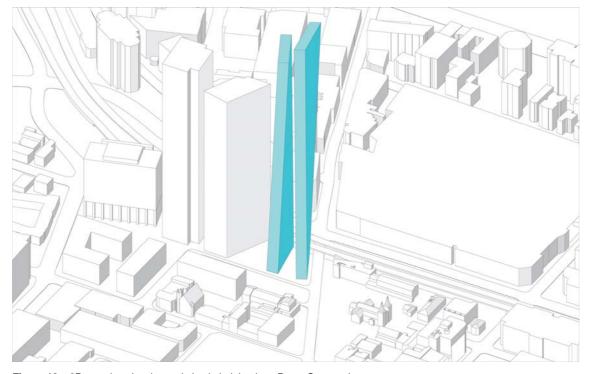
3D massing of wall of buildings at 220m fronting Darcy Street
